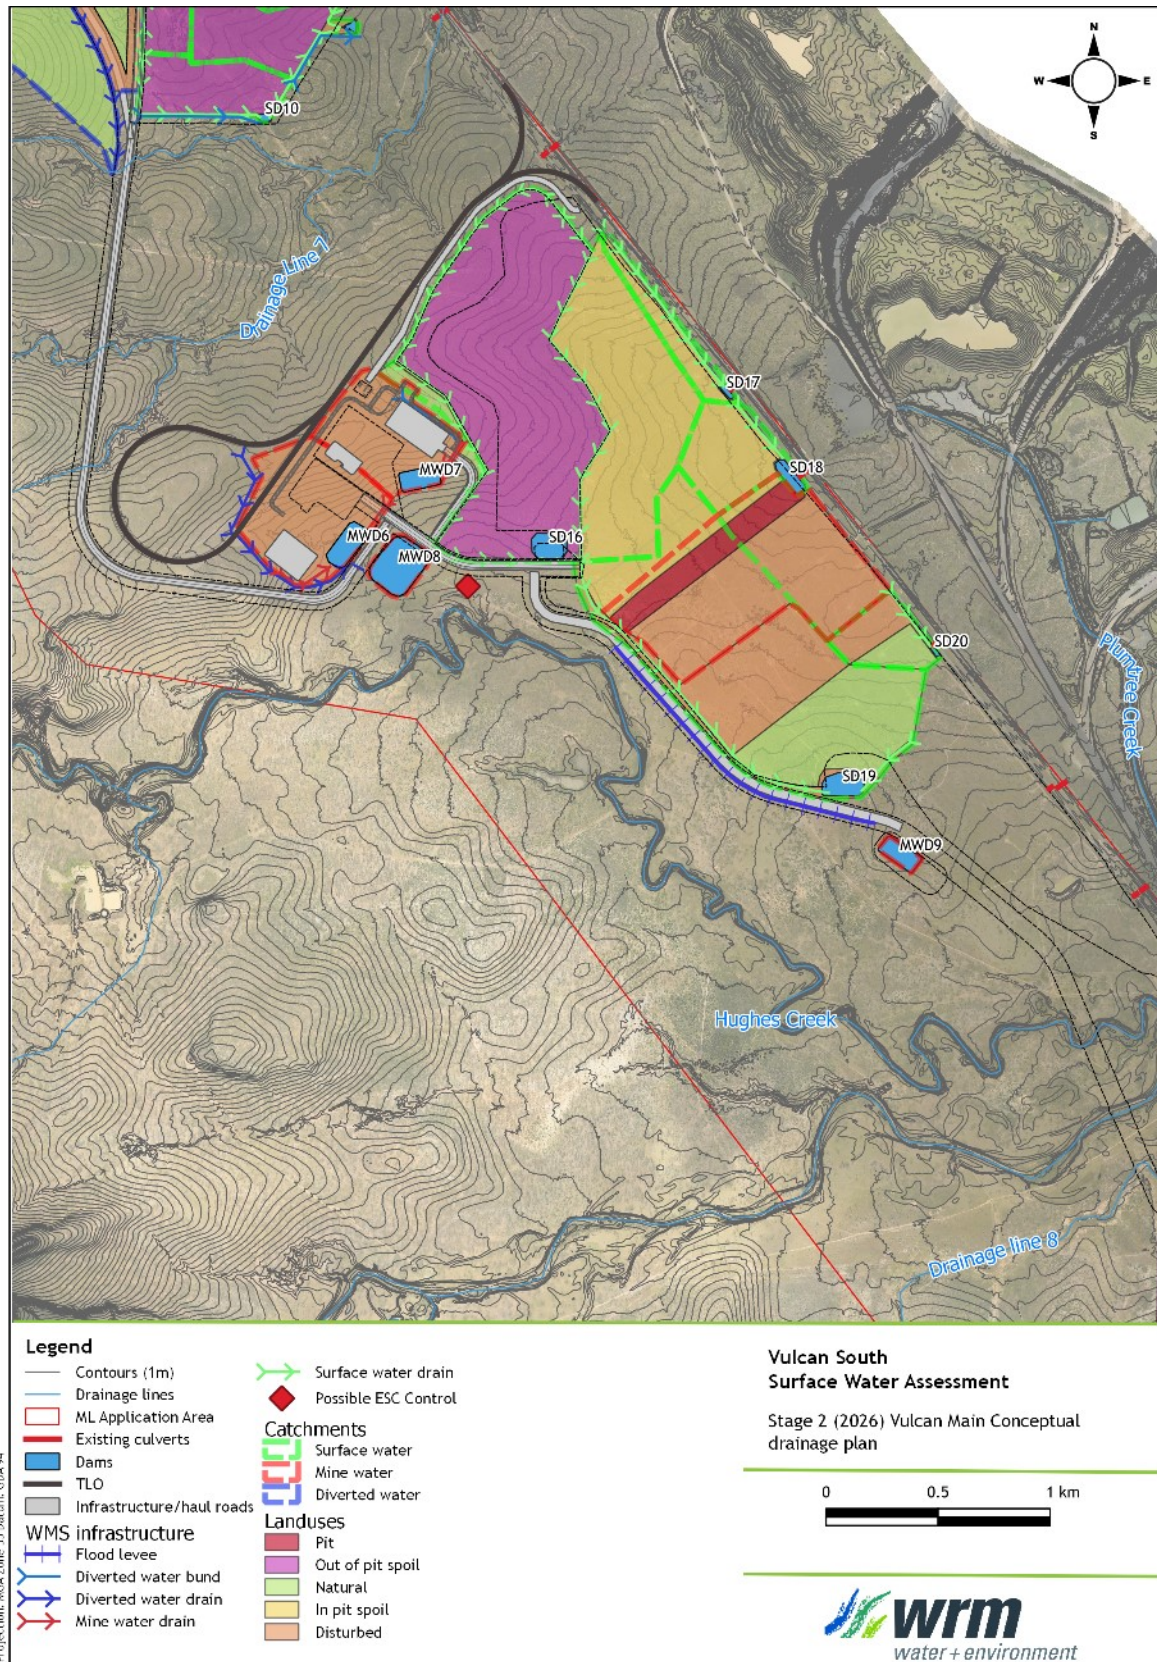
Stage 2 (Year 2026) Vulcan Main mining area conceptual drainage plan
